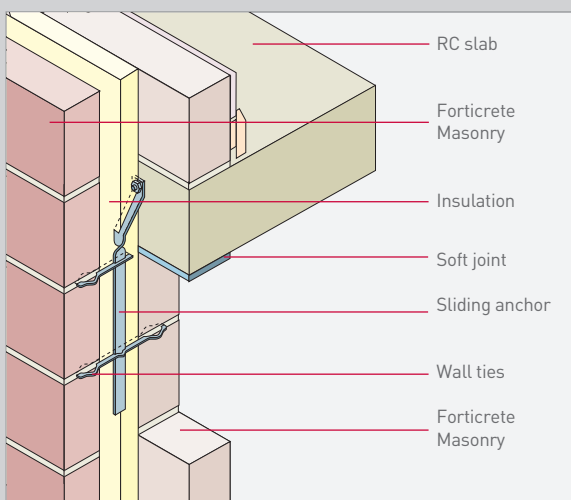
Junction of non loadbearing wall with concrete slab - with head restraint
